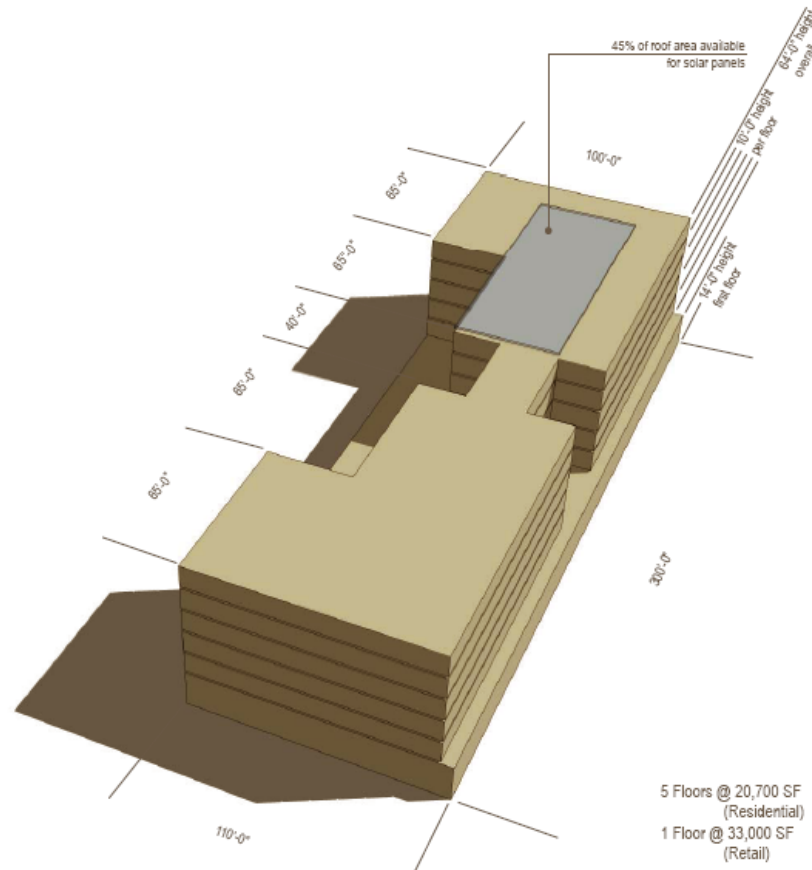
Retail/Residential Mixed-Use Mid-Rise Building
